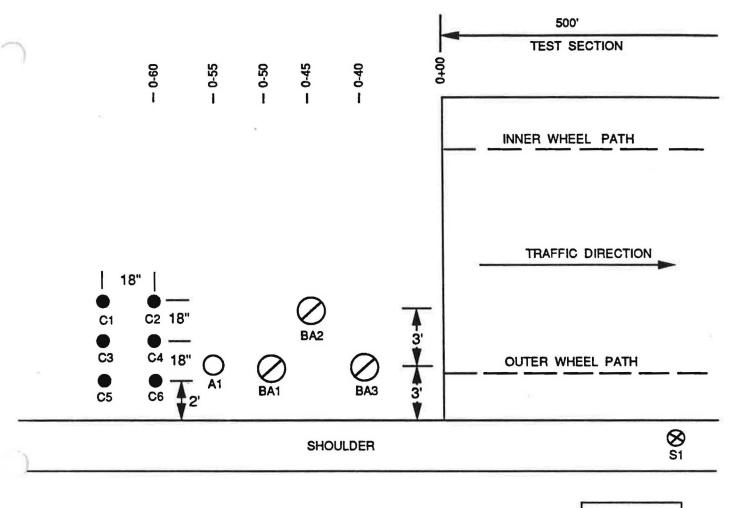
Sampling Point Locations Before Test Section, GPS-4 Jointed Reinforced Concrete Pavement
